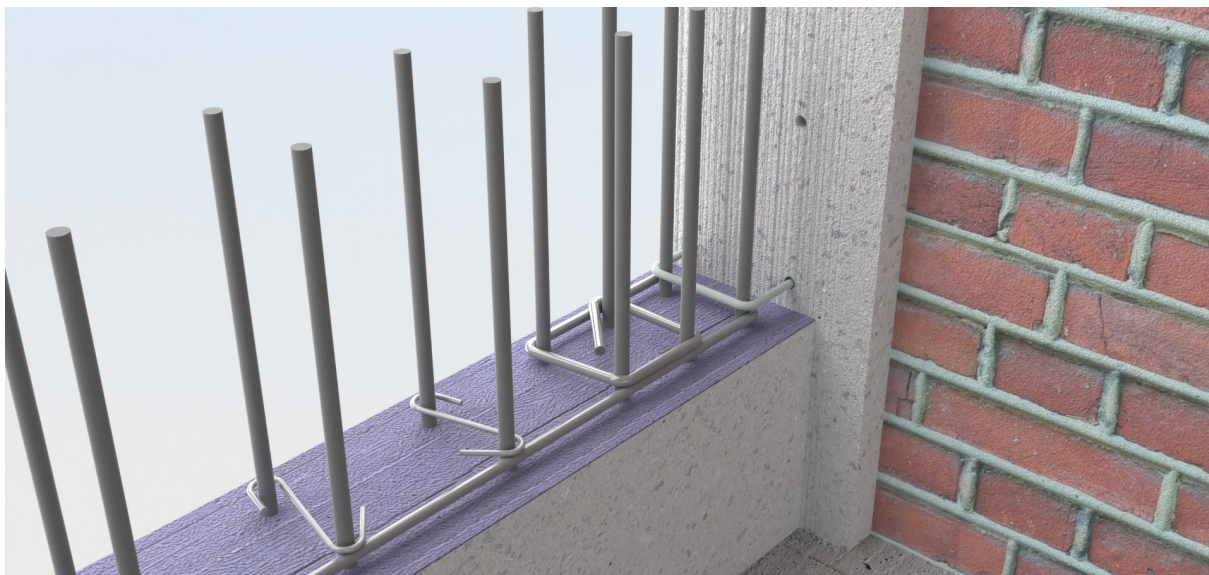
Reinforcement configuration at the base of the precast shear wall blocks, showing the dense arrangement of longitudinal rebars, stirrups, cross-ties, and shear dowels at the boundary zone, illustrating the need for cast-in-place concrete (author's own work)
